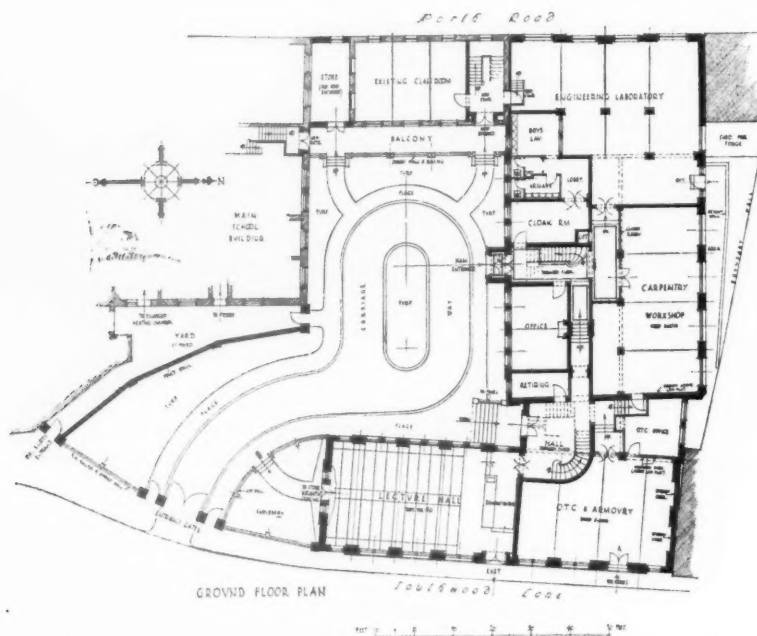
HIGHGATE SCHOOL: GROUND PLAN OF NEW SCIENCE BUILDINGS
